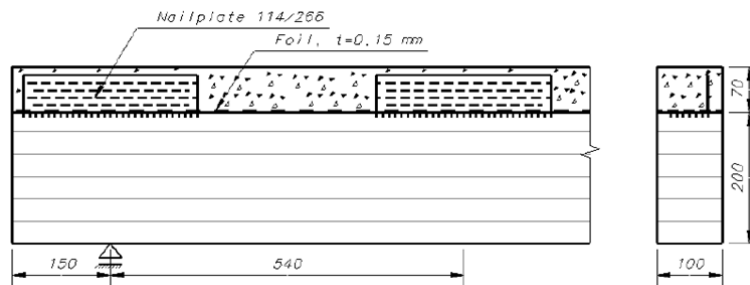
timber-concrete connection with punched metal plate fasteners (after Van der Linden 1999) (dimensions in mm)
